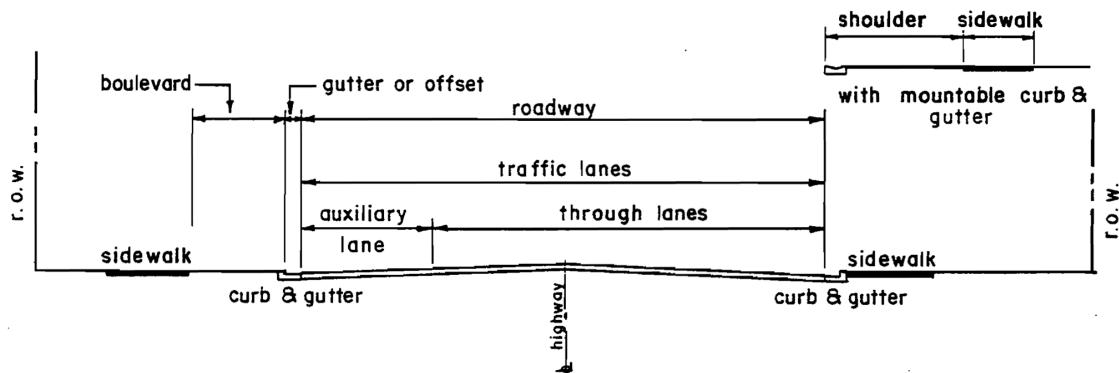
Example cross section design of a typical urban two-lane, undivided road (urban local road or collector) (part of Figure D1-2 [GDS85])
